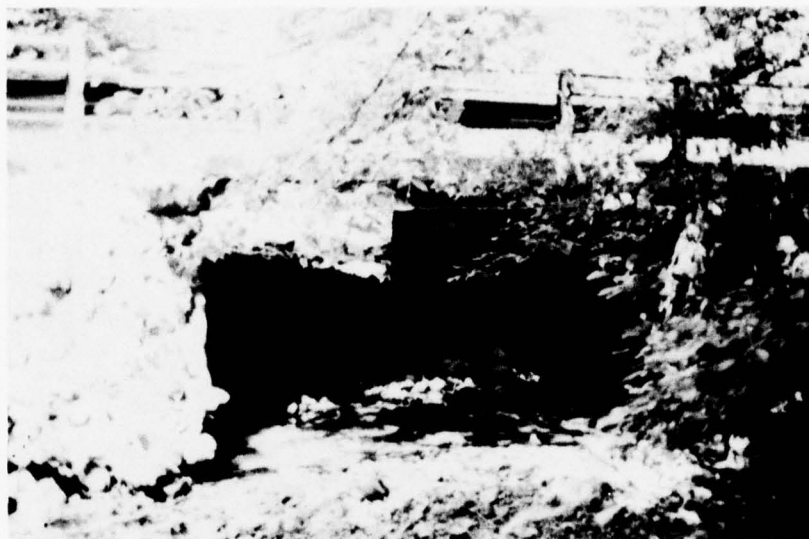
Downstream discharge channel and Squirrel Road bridge.
